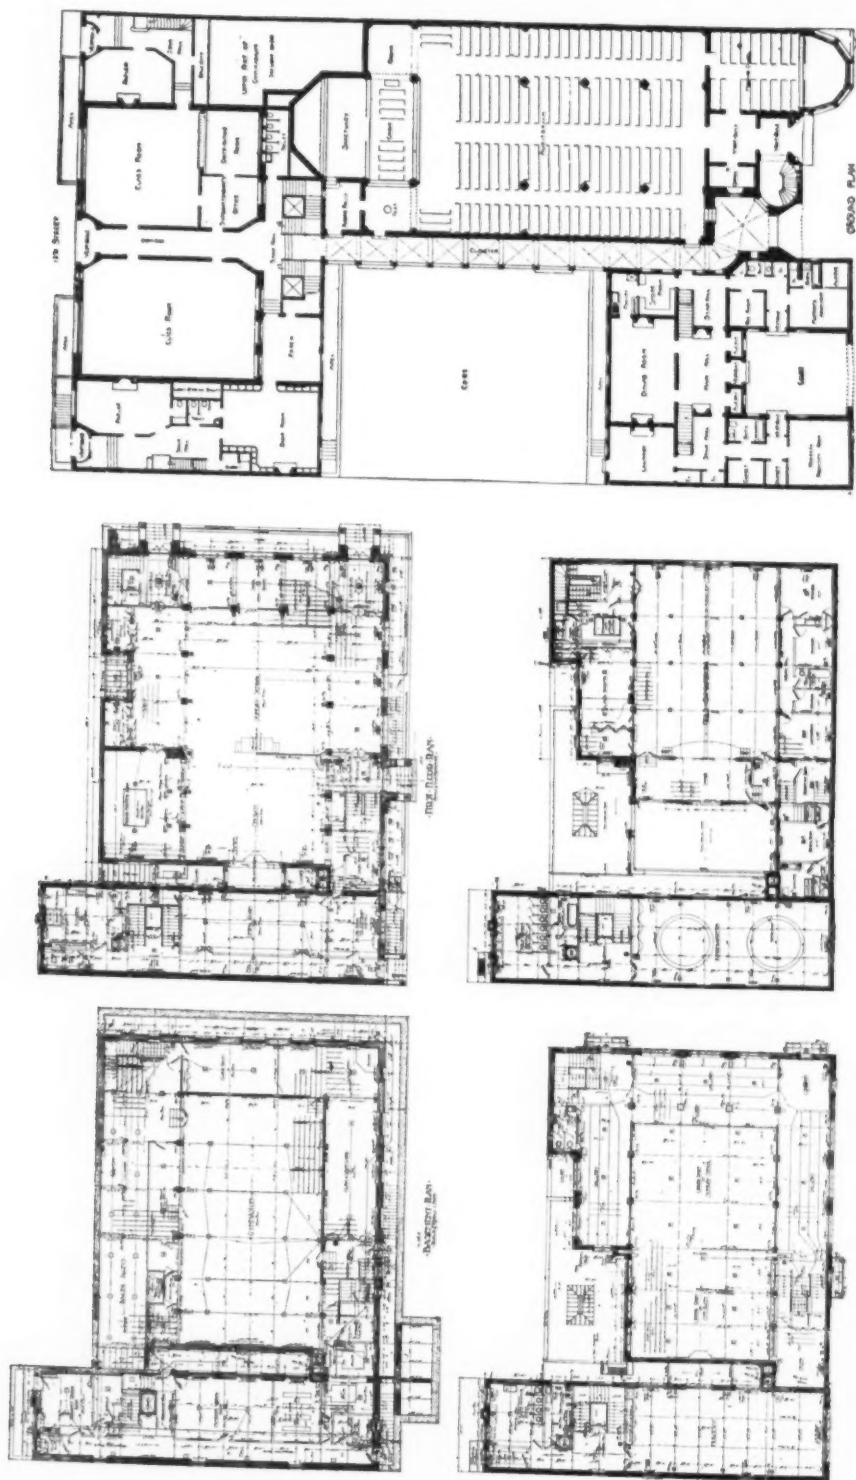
GRACE CHAPEL AND MISSION BUILDINGS, NEW YORK CITY.
